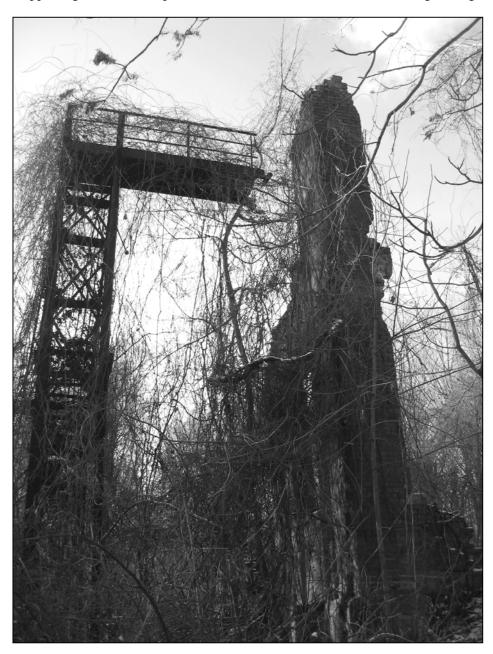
Northeastern corner of front east wing with adjoining self-supporting steel fire escape, facing southeast.
